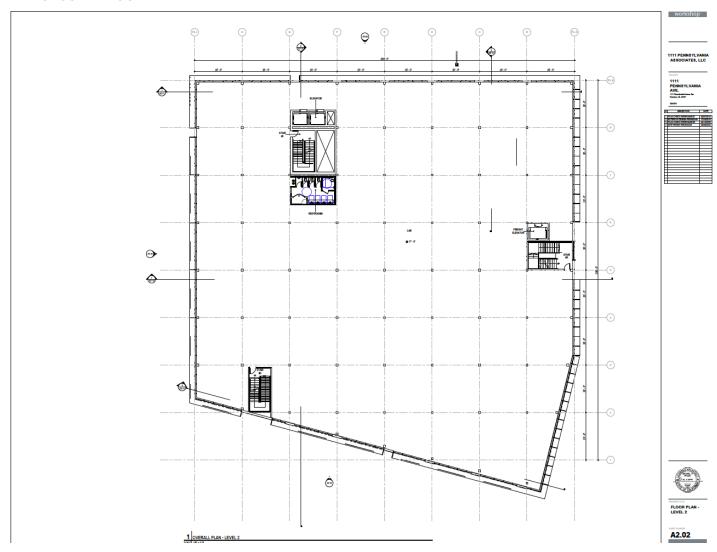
PROPOSED FLOOR PLAN - LEVEL 3
